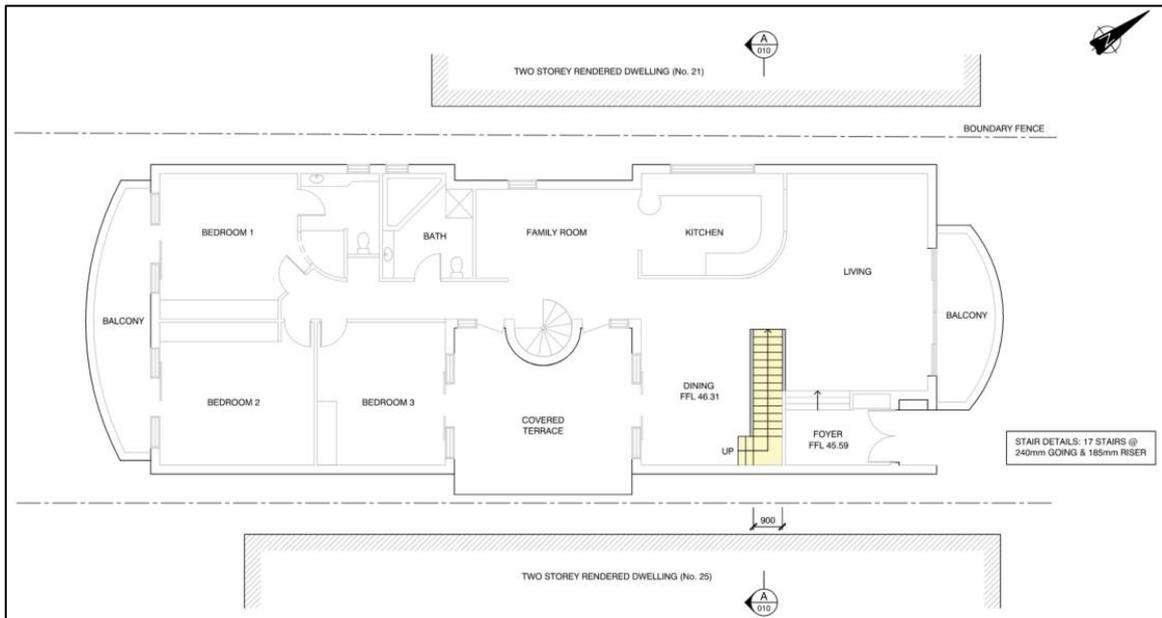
Proposed Ground Floor Plan (Source: Paterson Designs).
